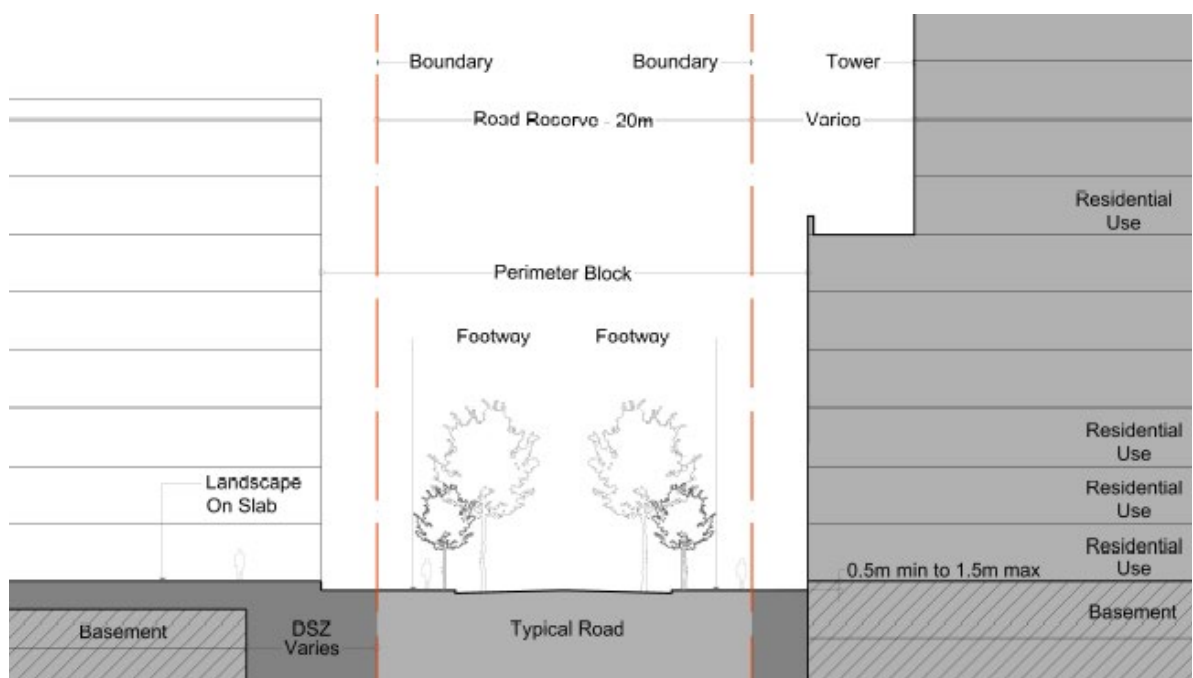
Courtyard Basement – Interface with Street
